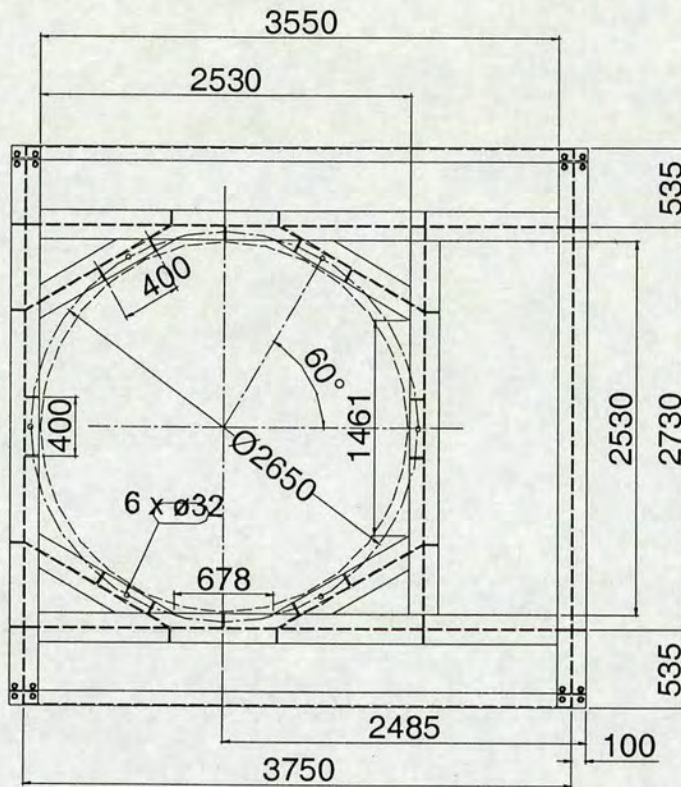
Arrangement of supporting platform (dimensions in mm)
